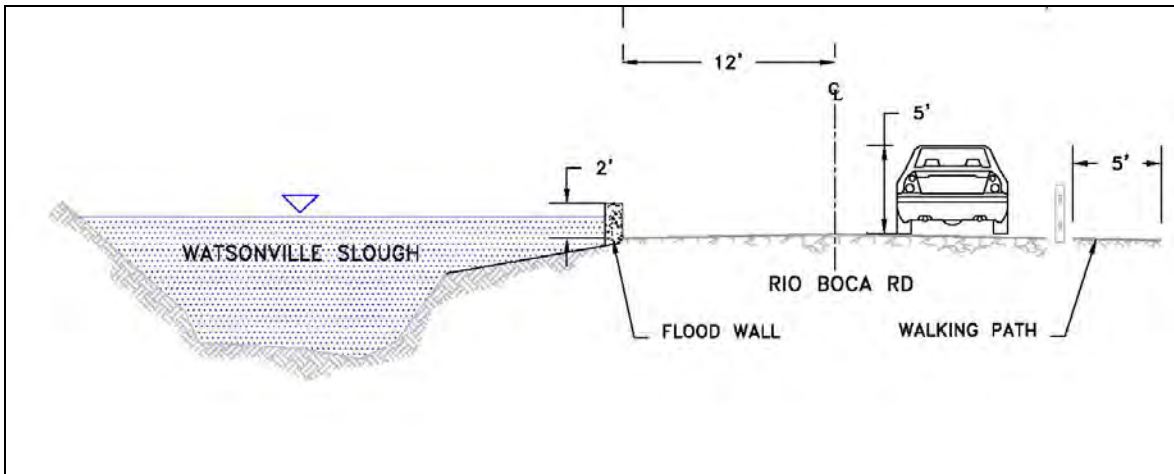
Alternative 9 -- Flood Wall Along Rio Boca Road
